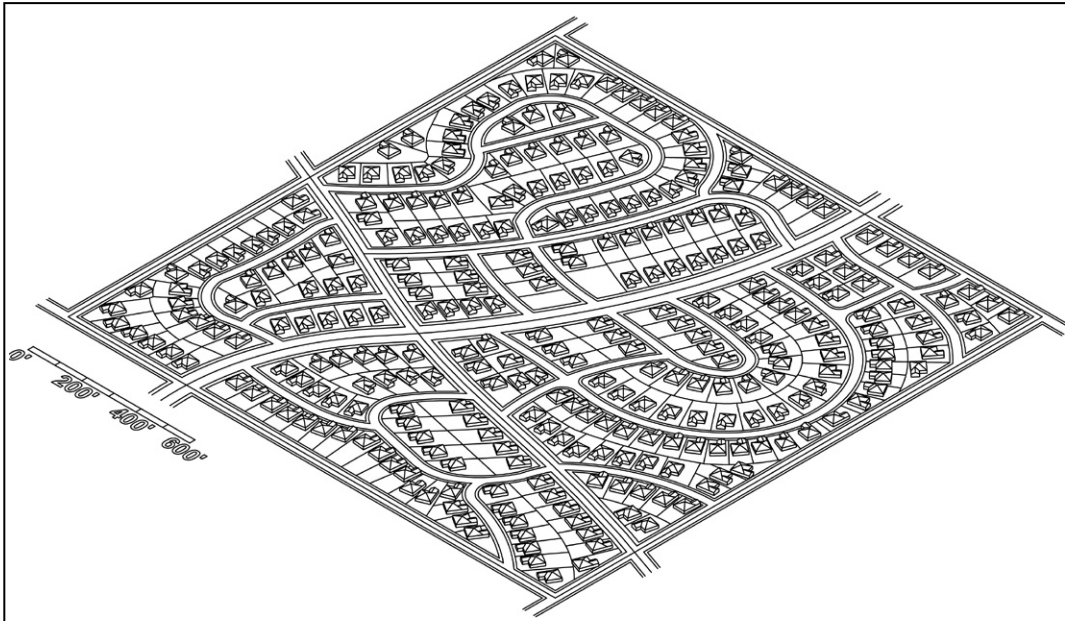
Isometric View of the Landscape Street Configuration Design Alternative
